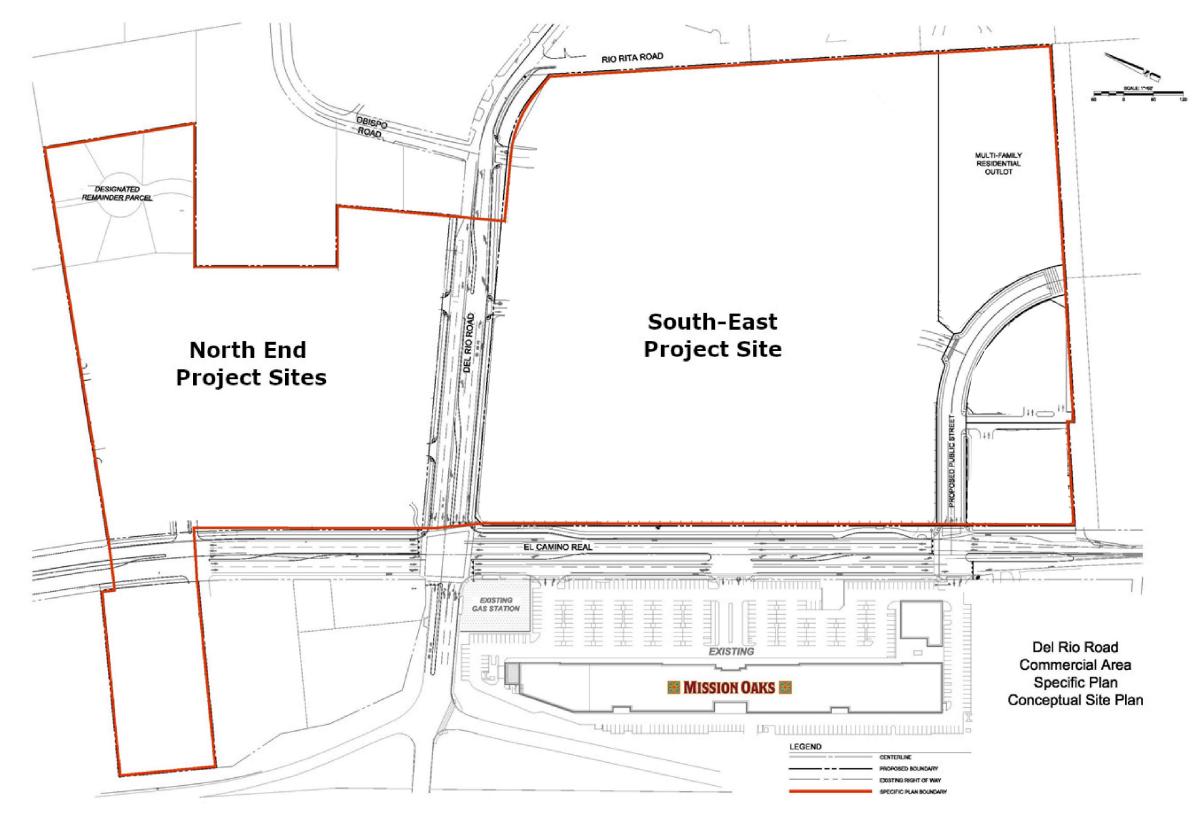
Del Rio Road Commercial Area Specific Plan Conceptual Plan
